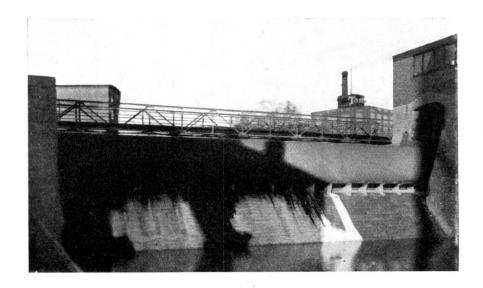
${\rm Hydro\text{-}electric\ plant\ at\ Tampere}.$ Bridge span 25.5 m, width 2 m. Roller weir entirely welded.
